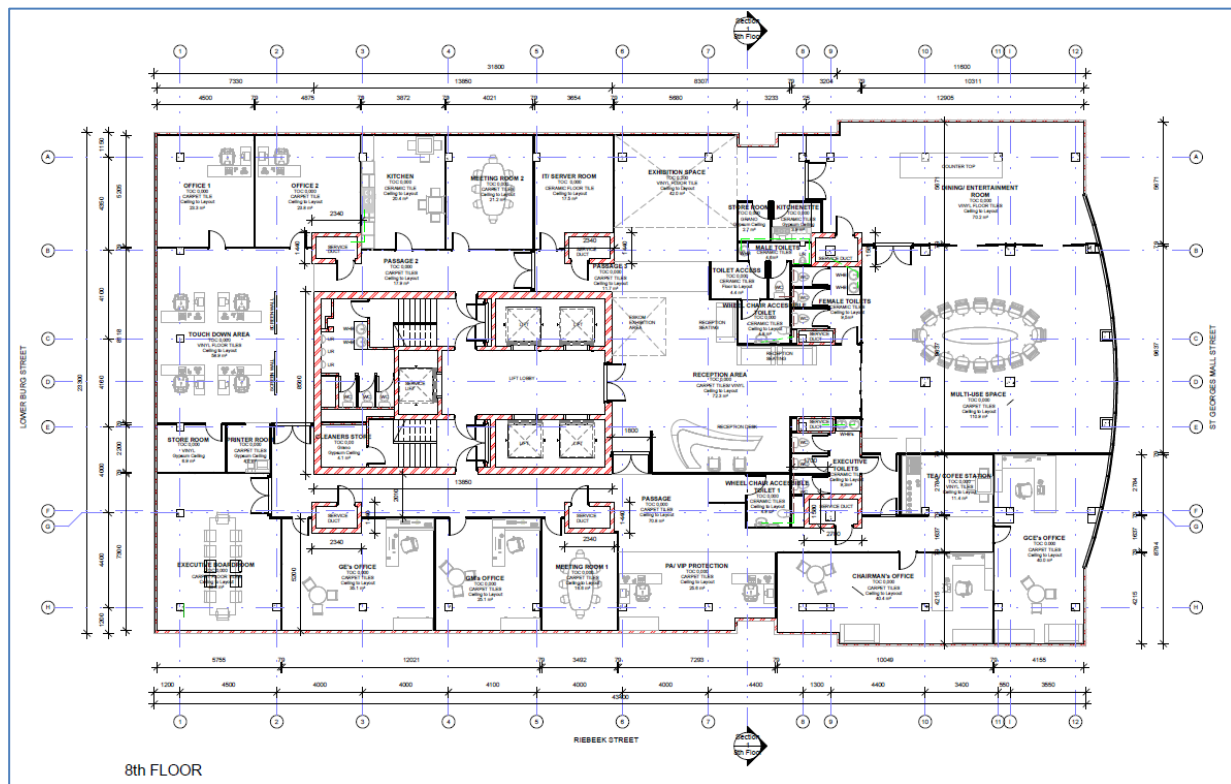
Proposed Parliament Executive Suite Floor Layout
